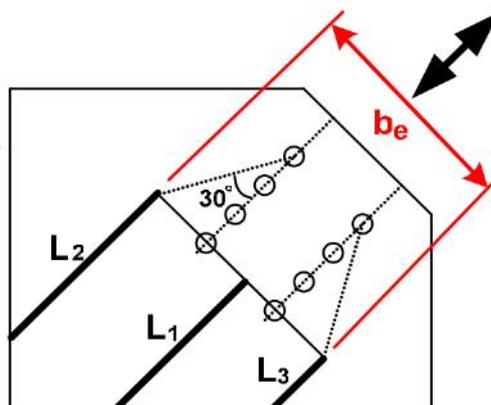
Gusset plate diagram indicating Whitmore effective width and Thornton Lengths (Tsai et al. 2008)
